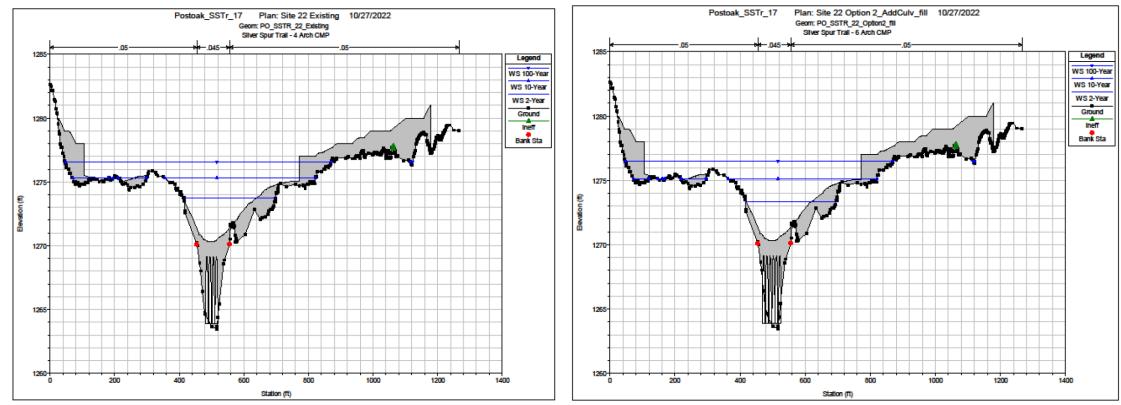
Cross-section of existing conditions structure with water surface elevations.
